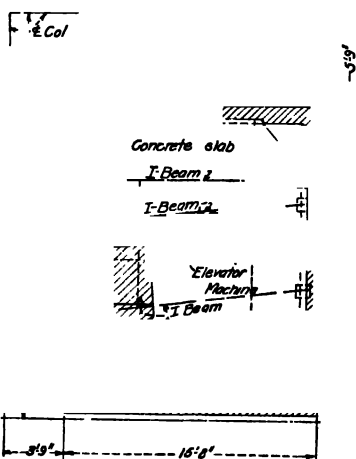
Elevator machinery floor of concrete supported on steel beams.
